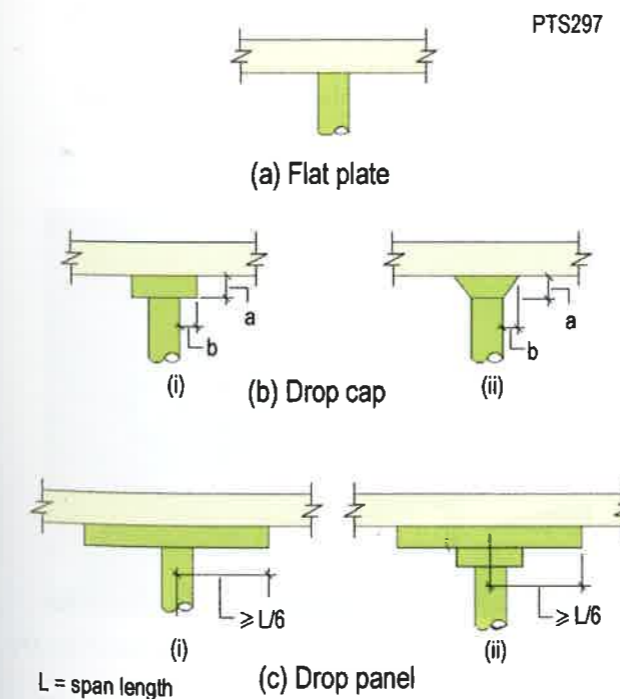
ACI318 Designation of Column Drop/Panel for Conventionally Reinforced Slabs
